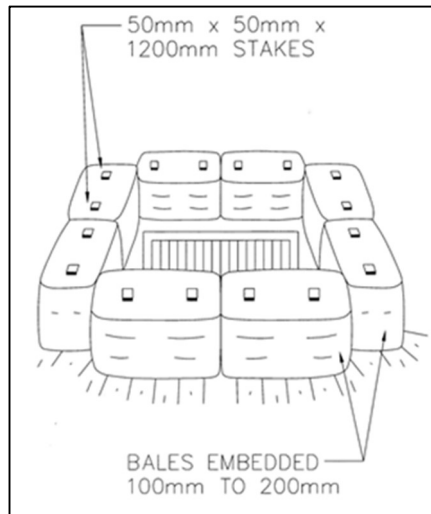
Stormwater Pit Sediment Trap (NTS)
